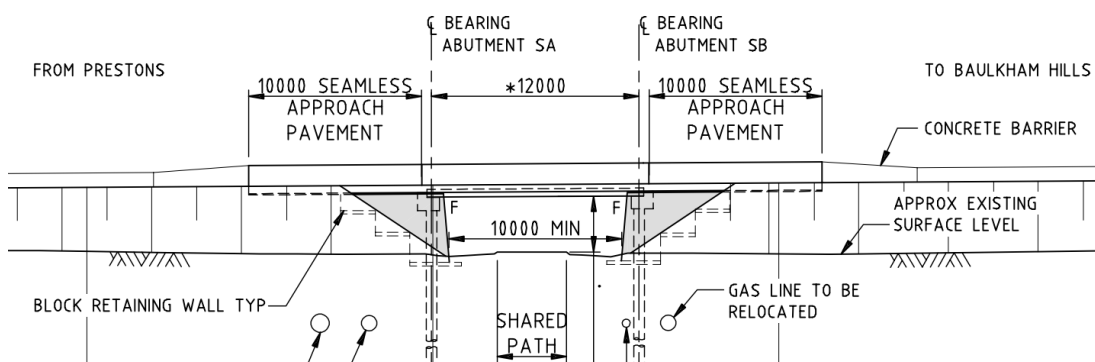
Elevation – Existing Plank Bridges Infra 35.1/35.2 over Shared Path at Florence Street
